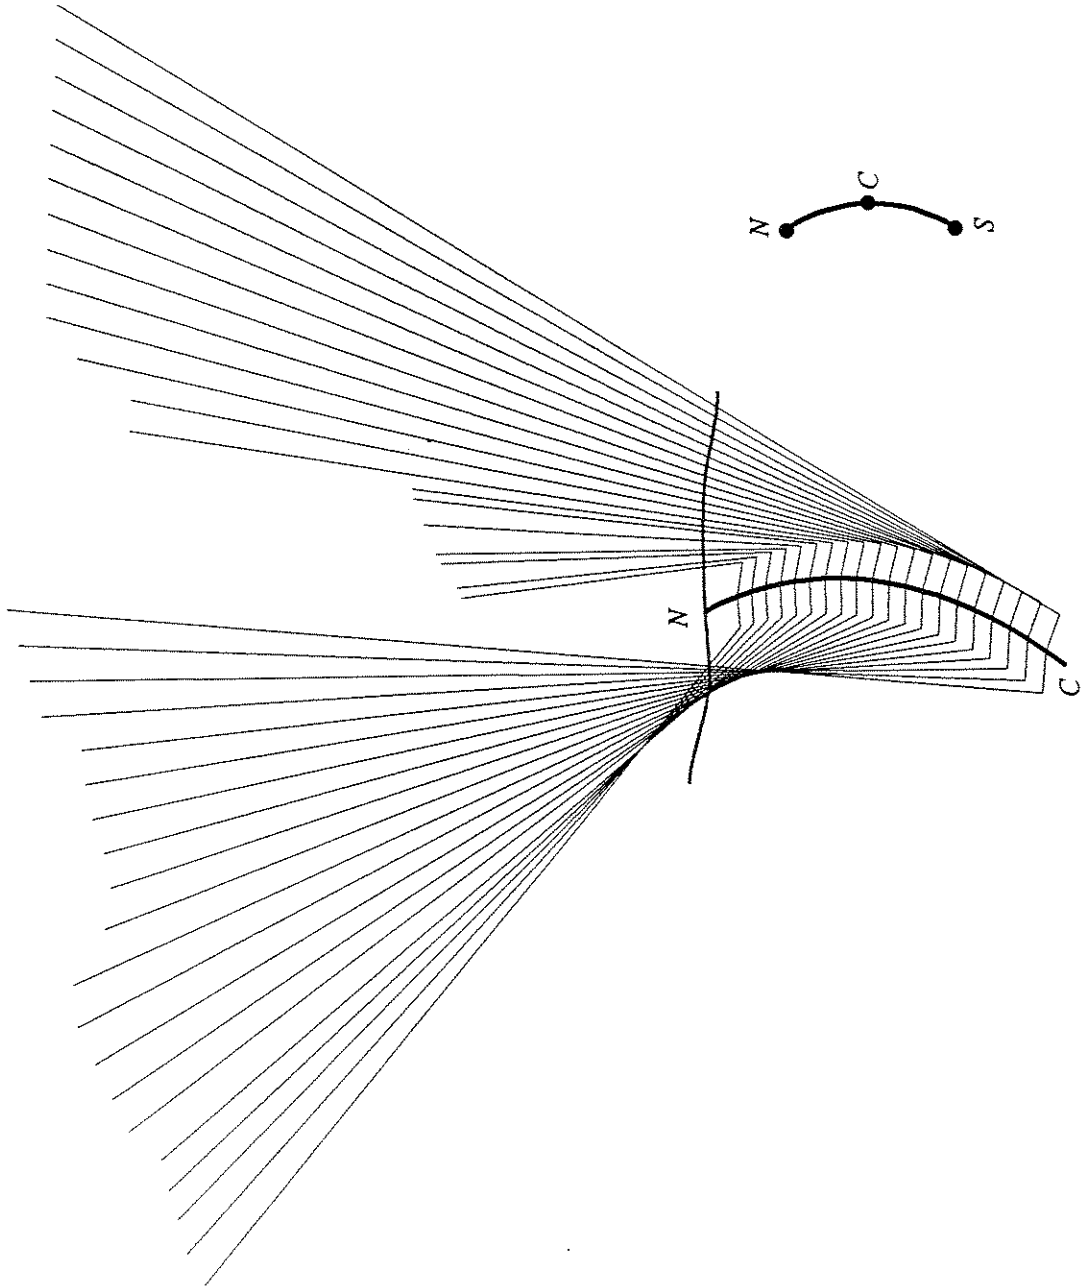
3 D MODEL OF HALF SPAN; RUCK-A-CHUCKY CONCRETE BRIDGE
